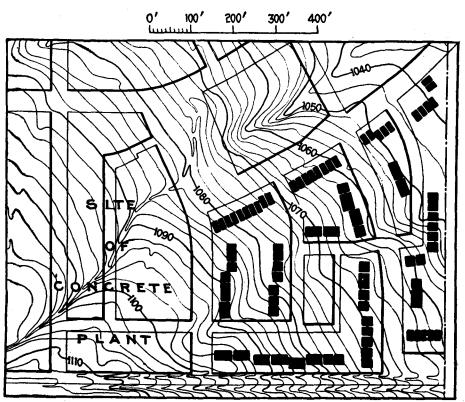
Site plan showing location of housing project in relation to concrete plant.
